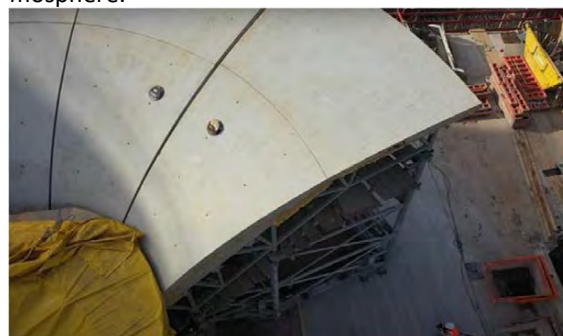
Image: formwork elements from the main station Stuttgart building site ©DB AG
